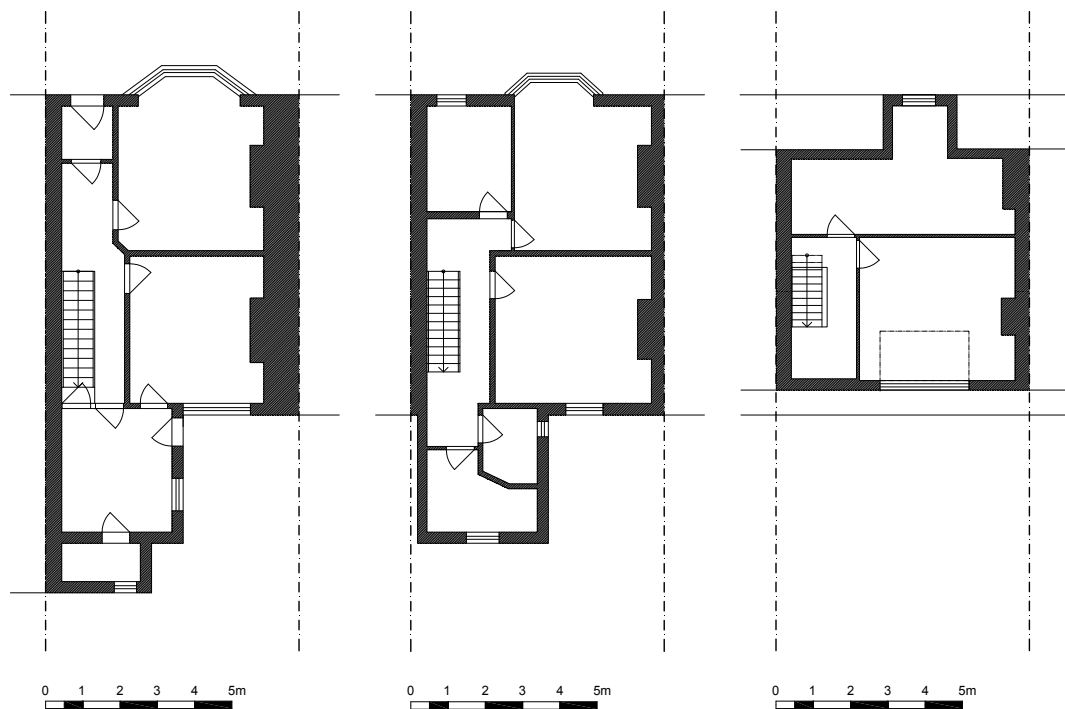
Floor plans - ground floor (on the left), first floor (in the middle), second floor (on the right).
